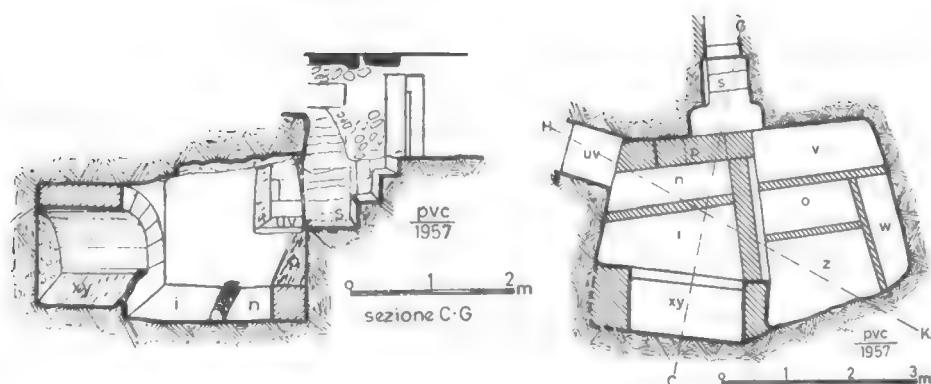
Section and top plan of the water installation (no. 63). Reproduced from Corbo (1965: 13, Figs. 10–11).
